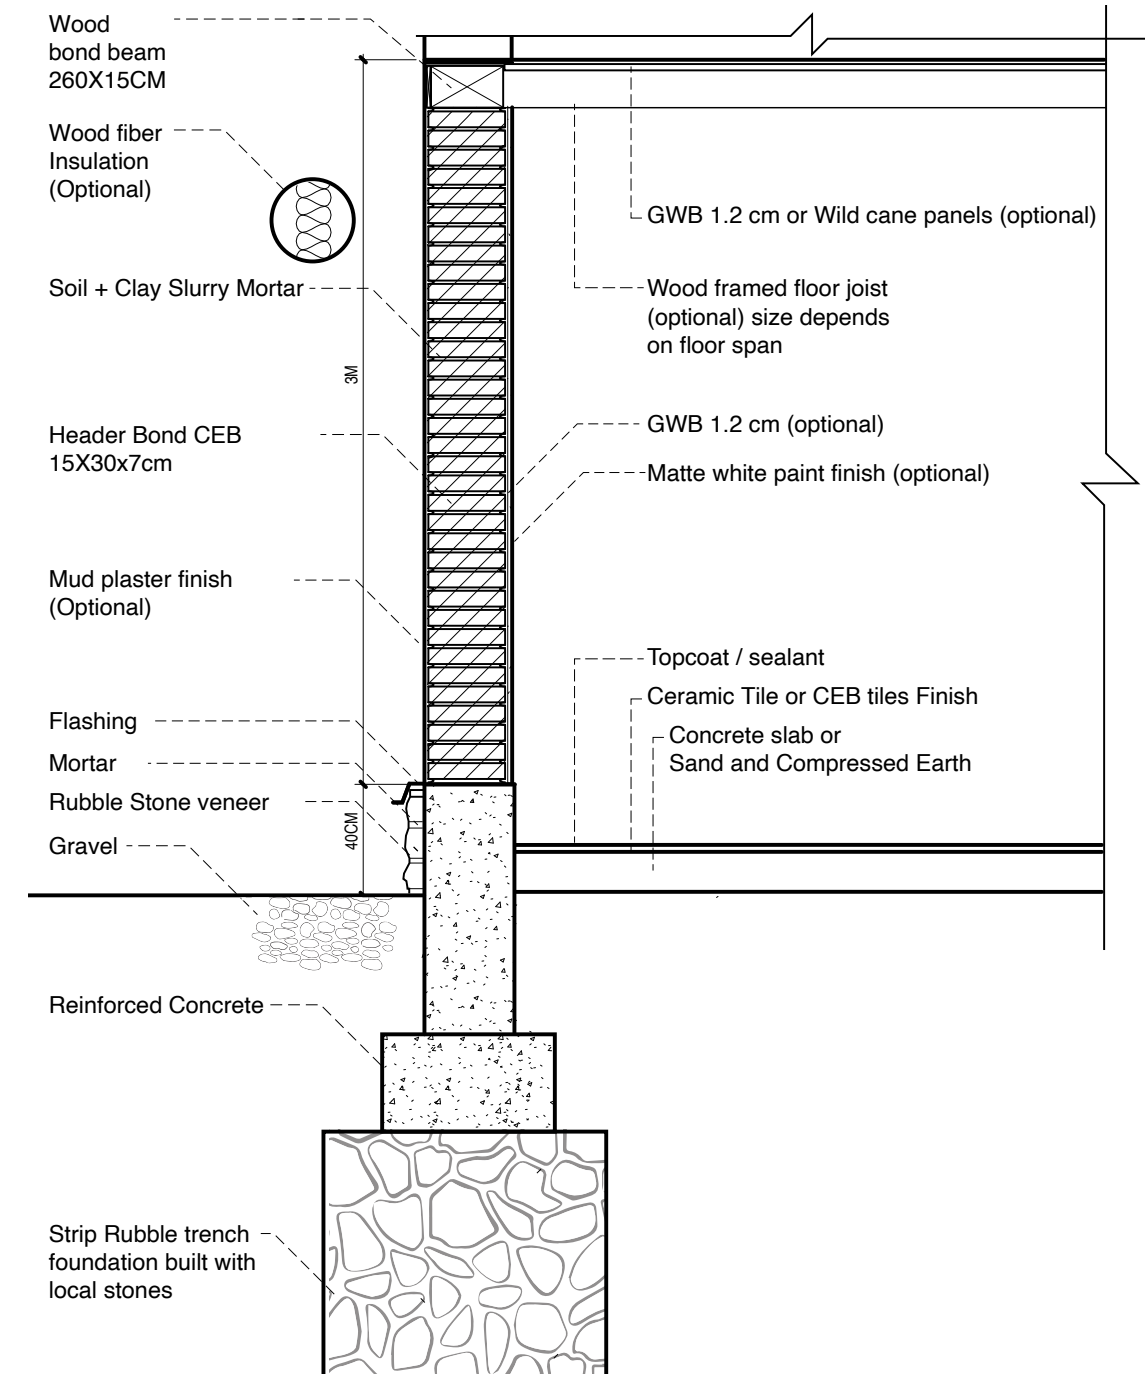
Foundation-Floor-to-Wall Detail Section at 1:15 (metric).
